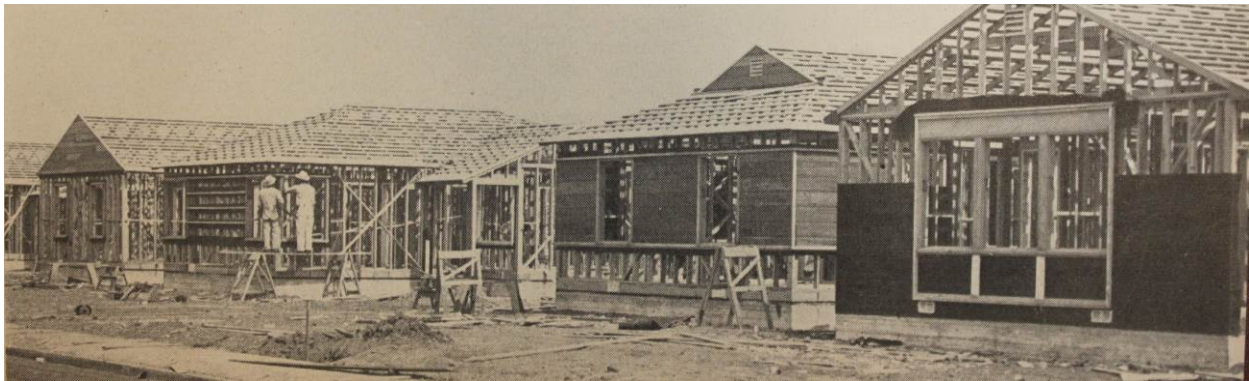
Houses in varying stages of construction at San Lorenzo Village. Source: *American Builder*, February 1945.
